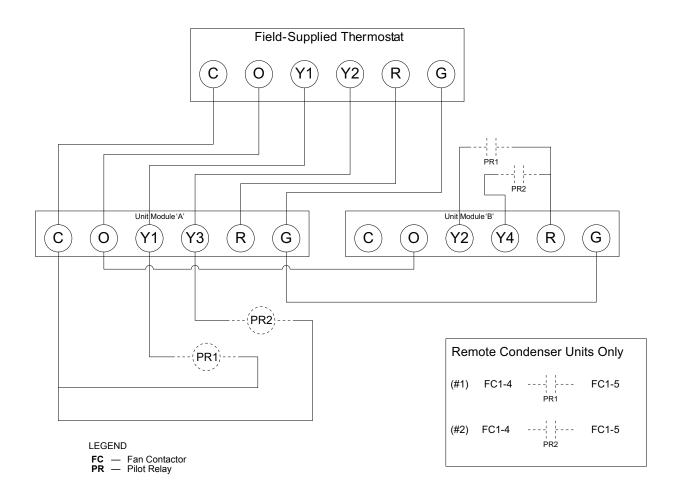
Typical Wiring 40 to 60 Ton Units (Two-Stage Cooling)
